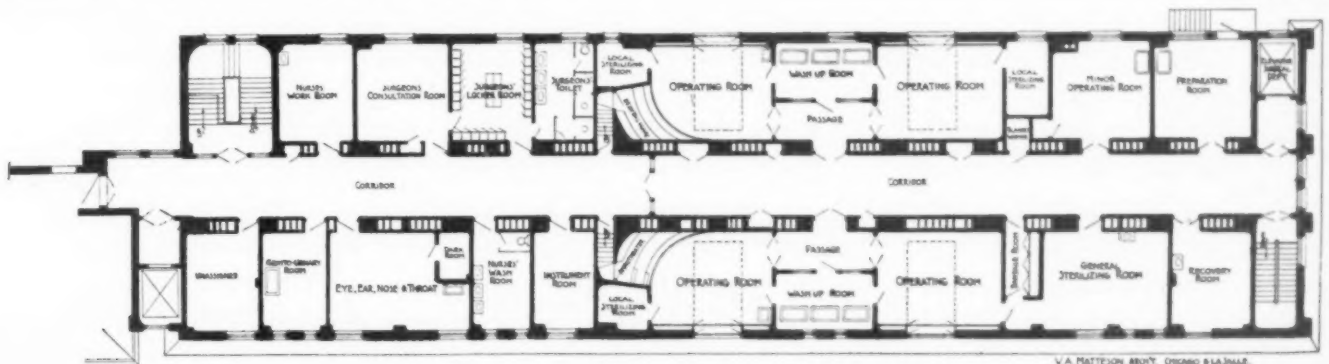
St. Joseph's Hospital, Chicago. Fifth floor plan.
